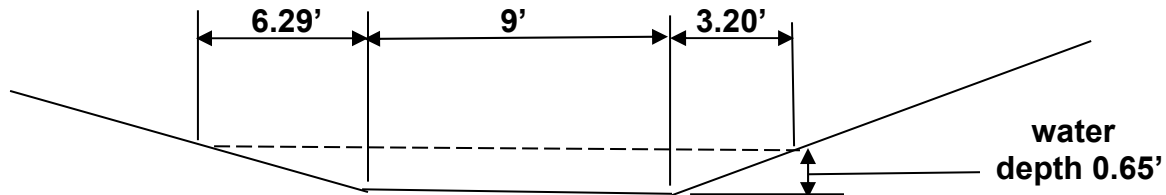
Cross-Section, Drainage Channel Section Two, 260' south,
